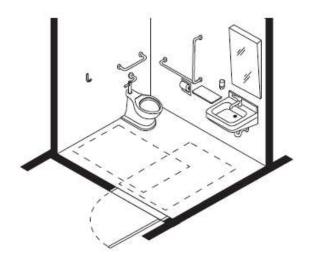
A Universal washroom with outward swinging door
